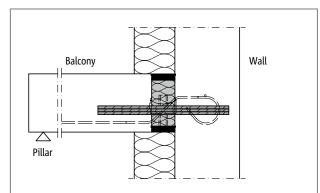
Schöck Isokorb® T type Q, H-VV-NN: Connection to a reinforced concrete wall with external insulation
